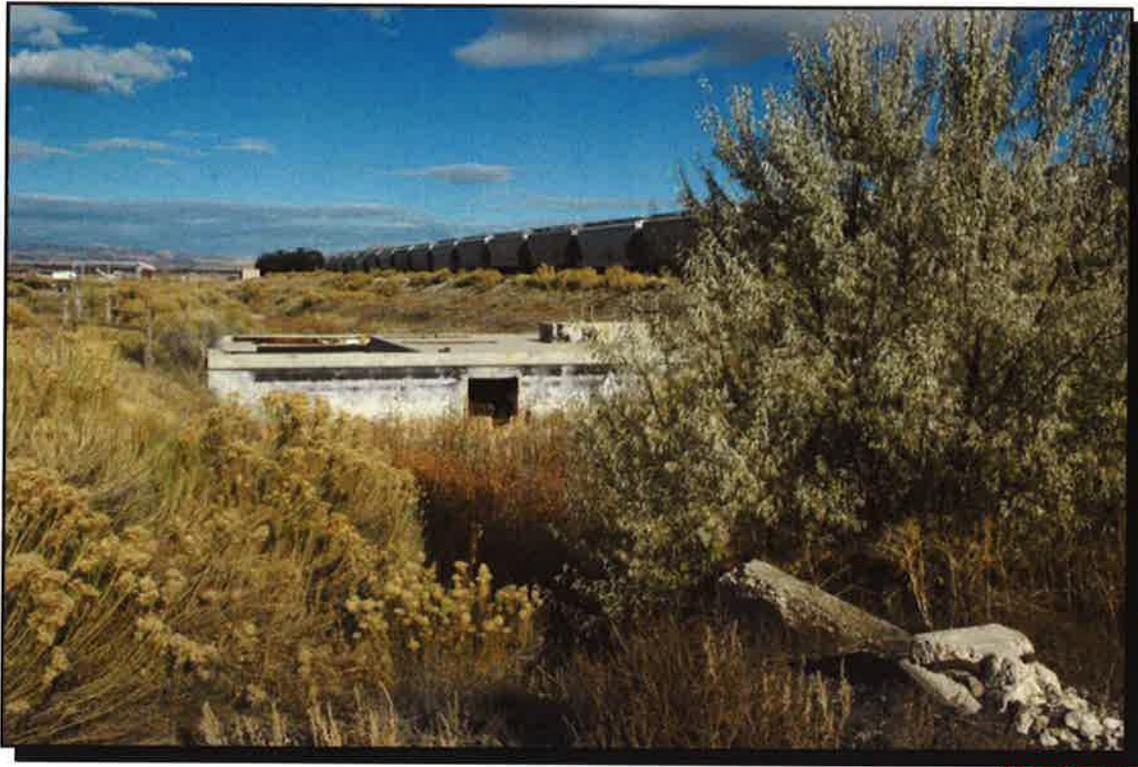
Photo E: Remaining Concrete of Old Wash Plant [see Demolition]
